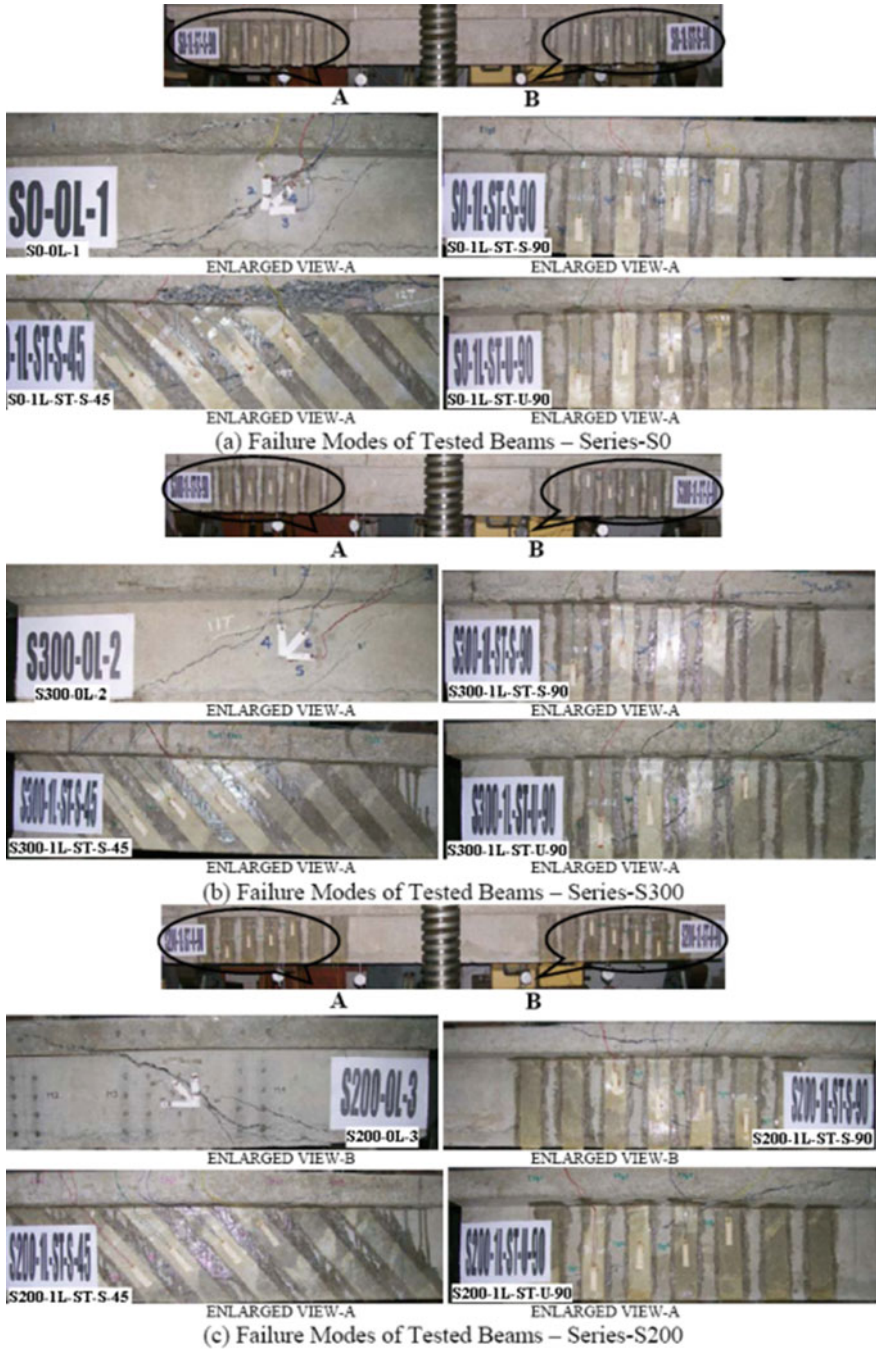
Failure modes of tested beams (GFRP strips)
